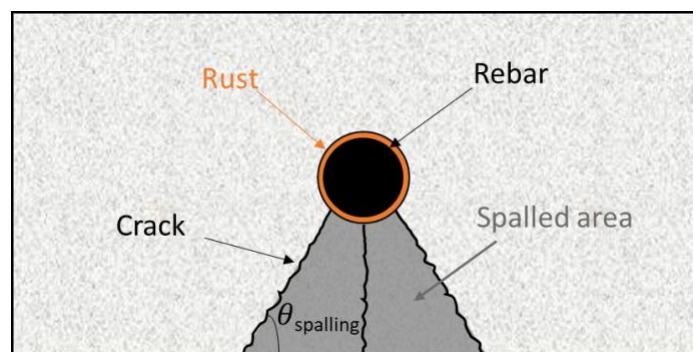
Simplified concrete spalling model shown in cross-section view
